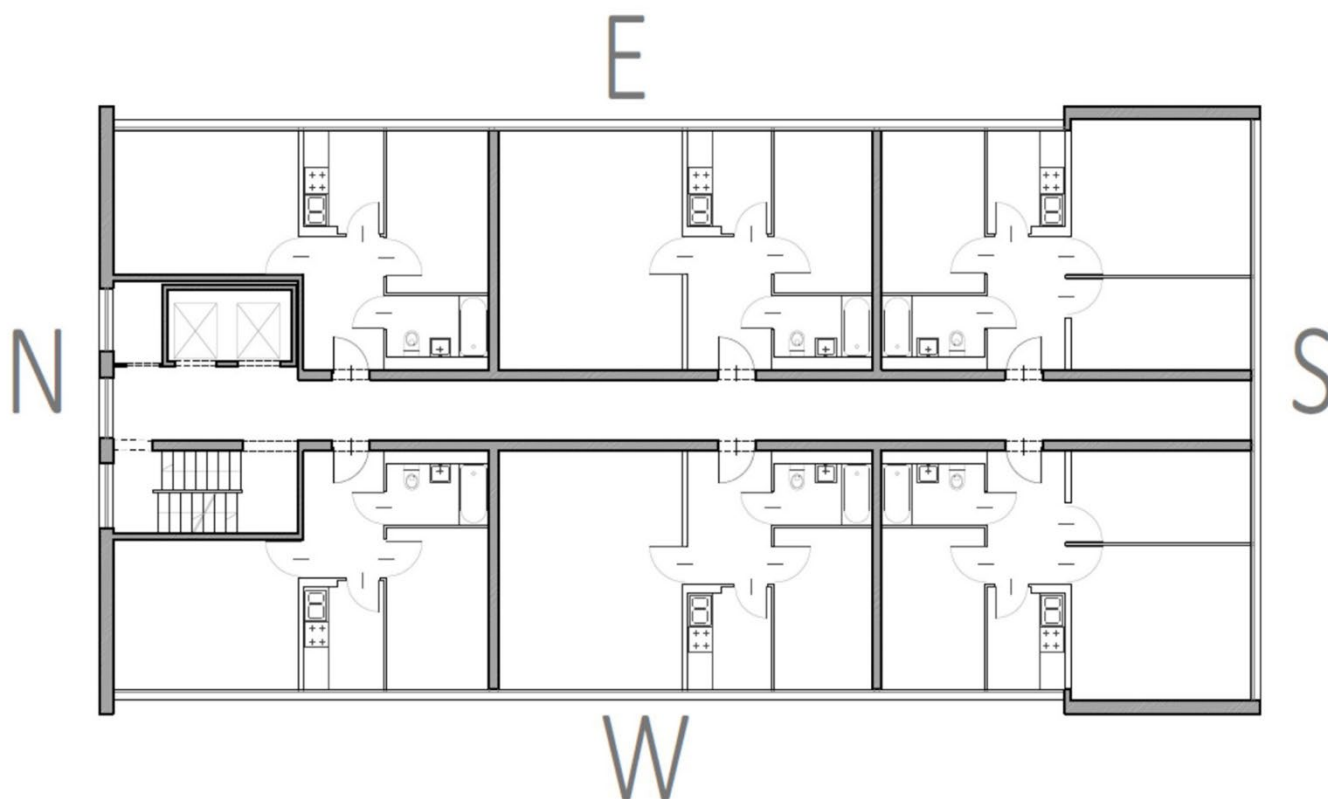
Plan of the repetitive floor. *Source:* own study.
